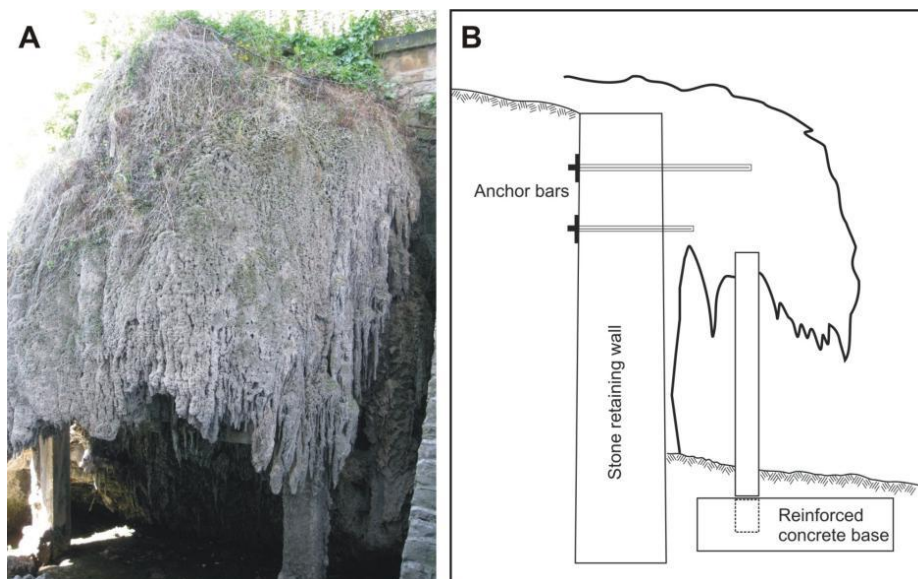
Tufa lobe located in the Marina Activity Centre of Sunderland. A) Tufa deposit develops on a retaining wall forming an overhanging lobe. B) Cross-section of the retaining wall and tufa deposit showing the anchorage and pre-cast concrete frame. (Based on a sketch reproduced in Fenwick & McLean, 1996).
